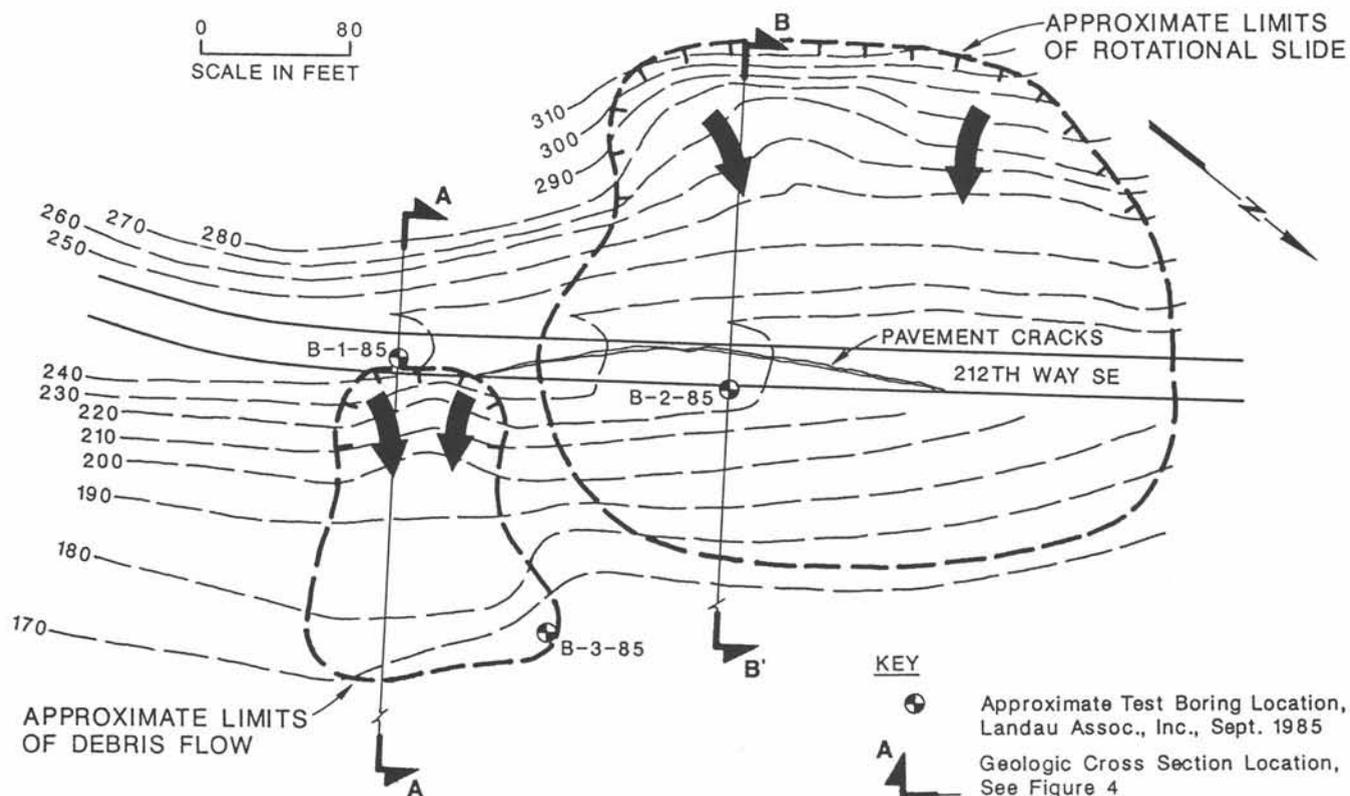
Site plan showing debris flow, rotational slide, and location of test borings and cross-sections.
